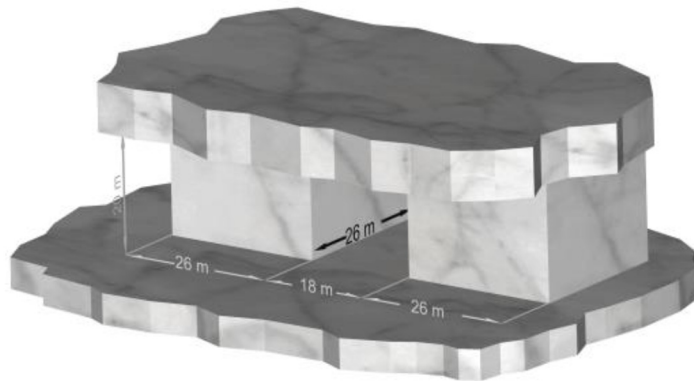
Room and pillar layout - Level 3 (Castro, 2015)
